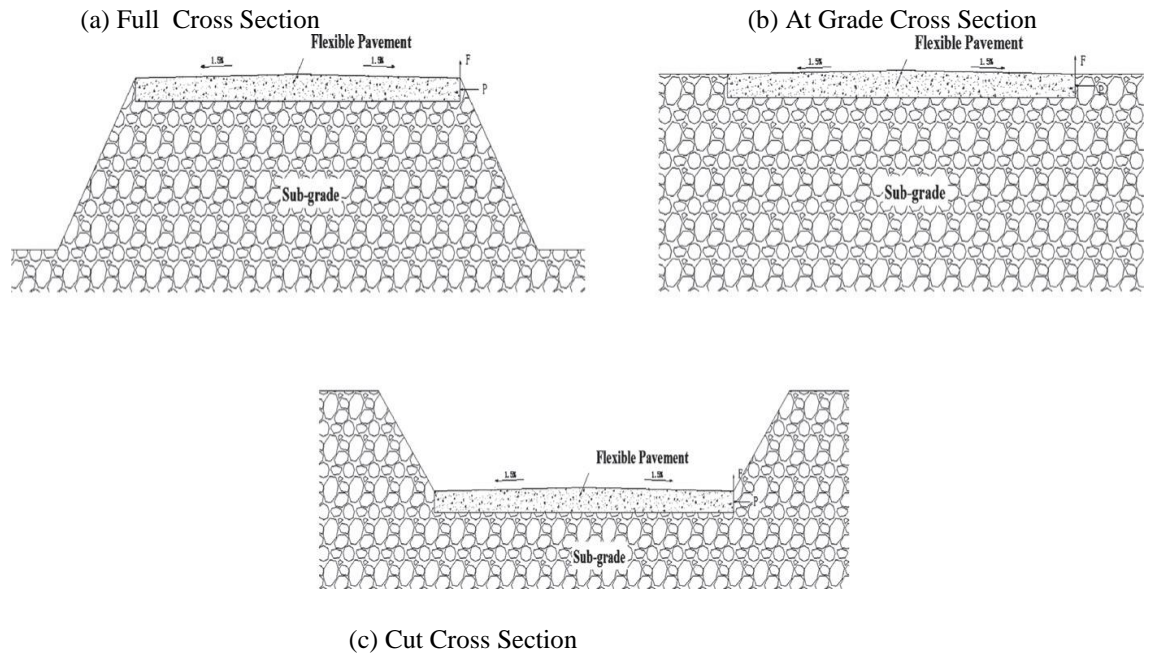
Flexible pavement typical cross section geometries (Wang *et al.*, 2012)
